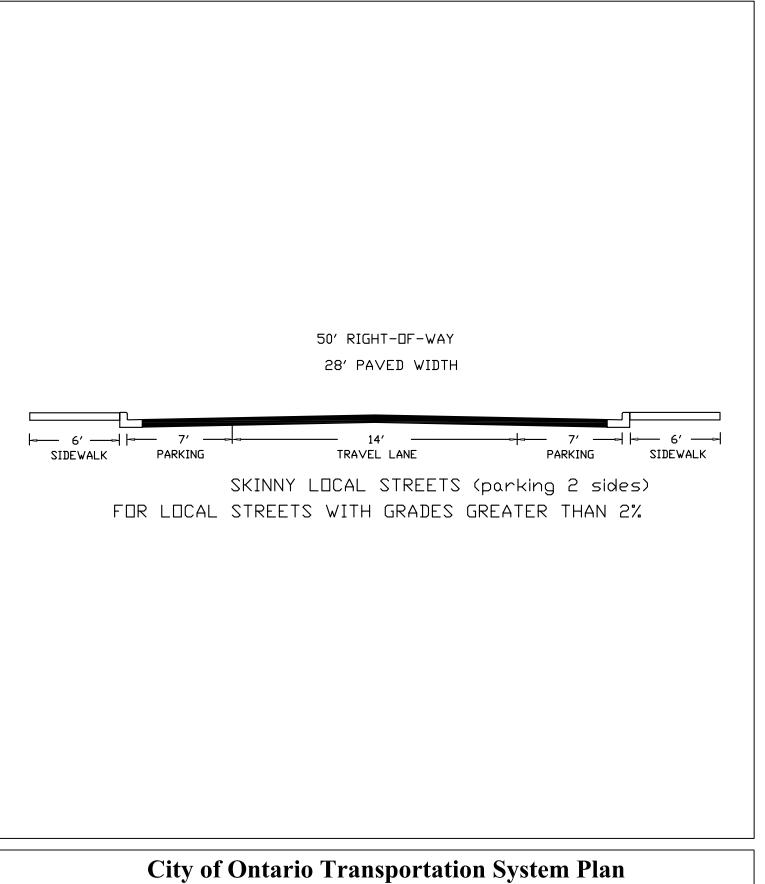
Typical Roadway Cross Section Standards Skinny Local Street Greater Than 2%
